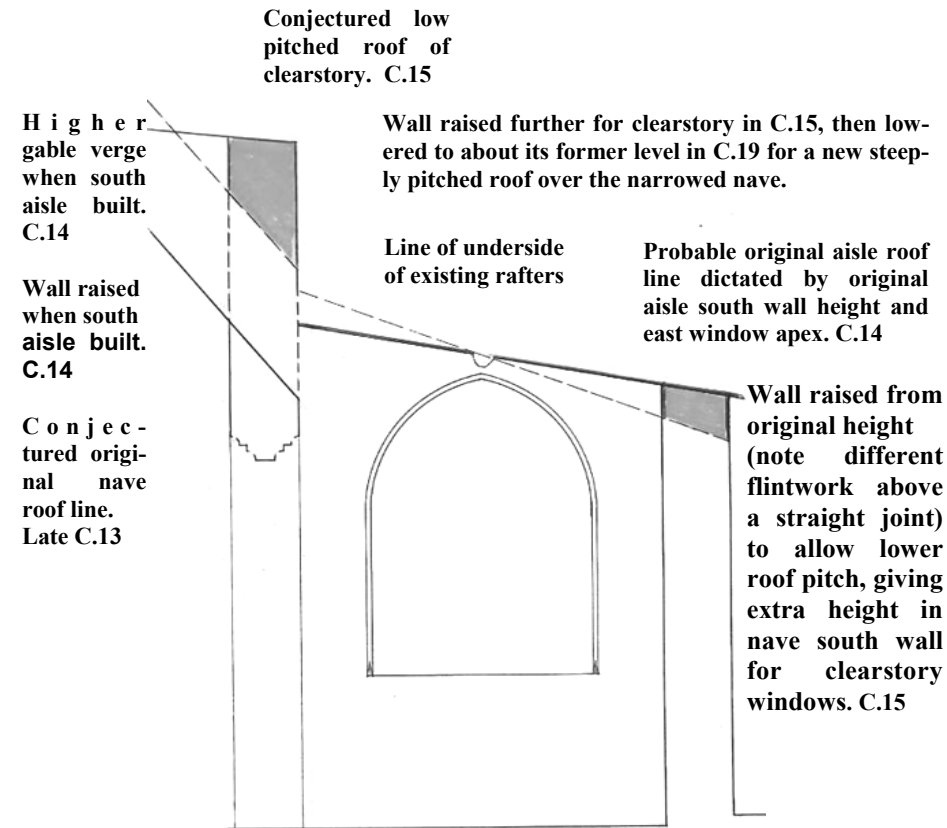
Diagrammatic Section through South Aisle and Nave South Wall. Broken lines indicate association with building the south aisle. Shaded areas indicate alterations related to the clearstory construction. Precise positions of roof lines on nave south wall are conjectural.
